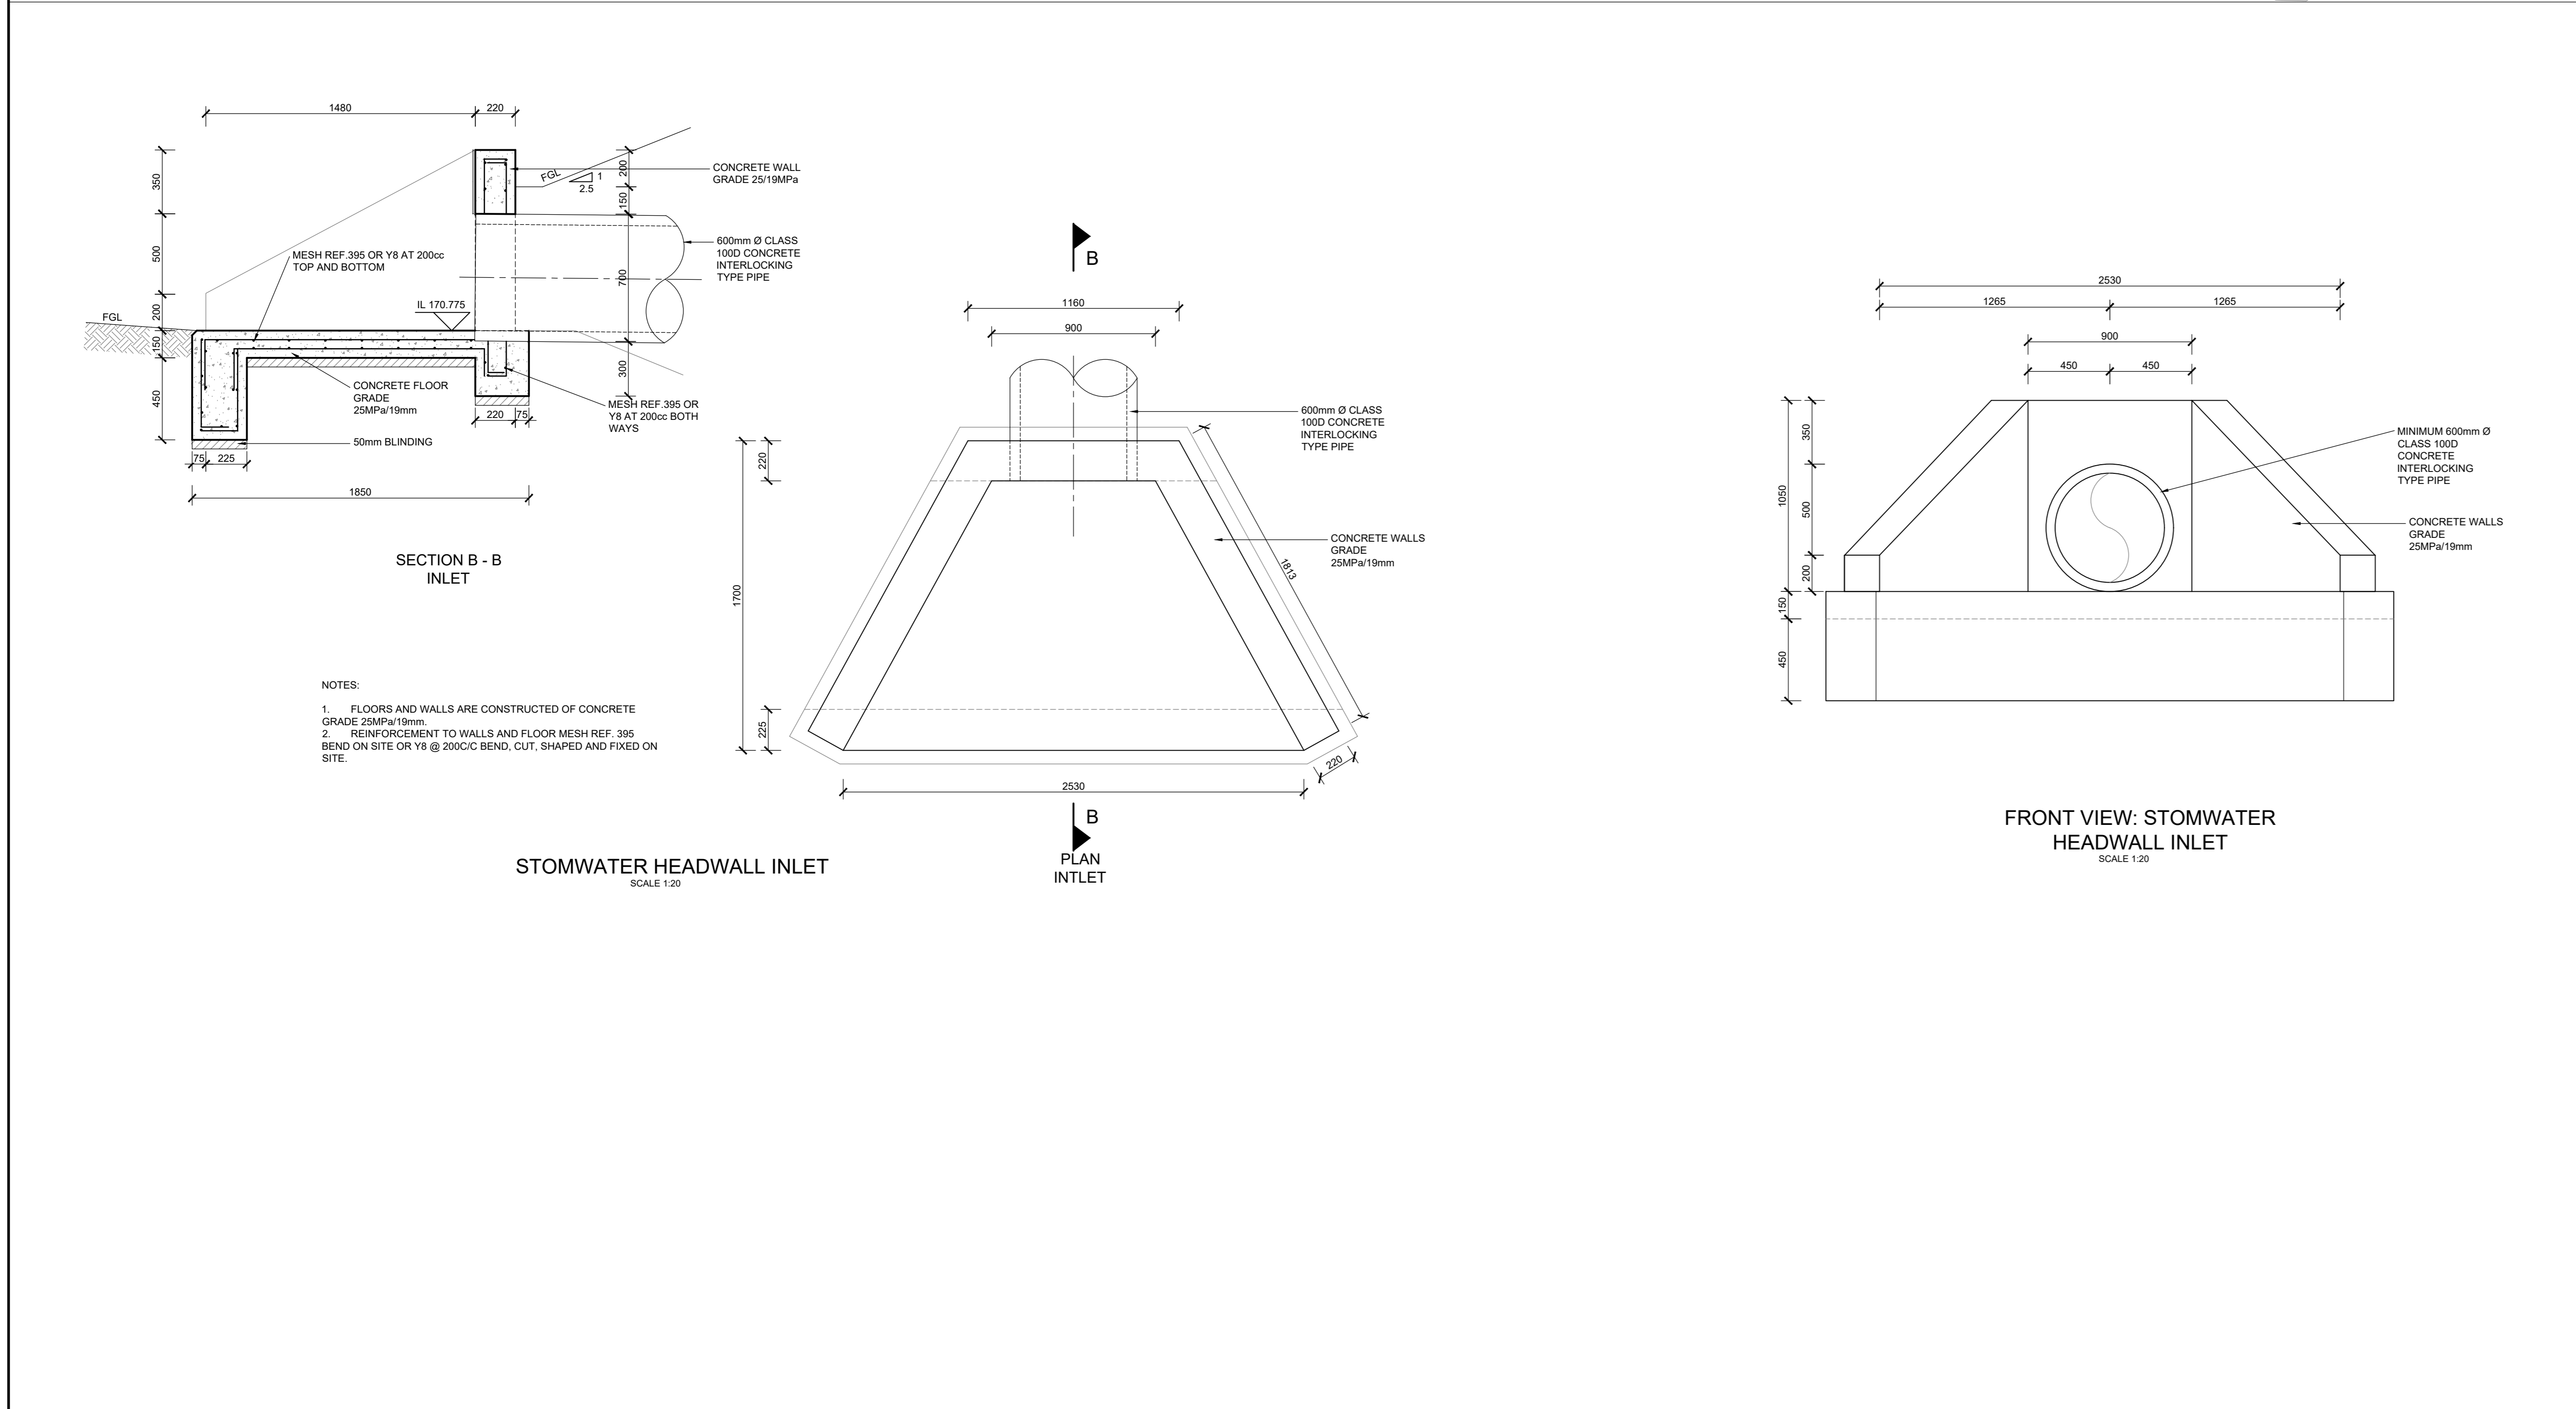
or 2: MAIN STREAM CROSSING PIPE
